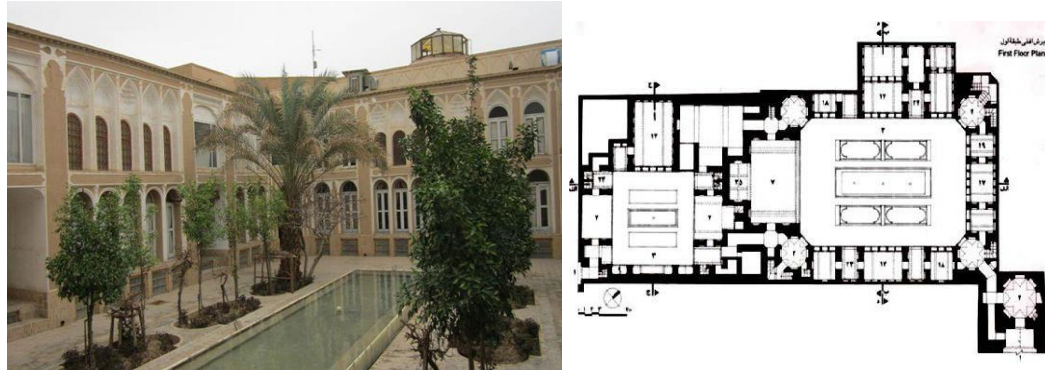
Picture and plan of Yazd courtyard house example - Mortaz house (Source: Hedayat et al., 2015)
